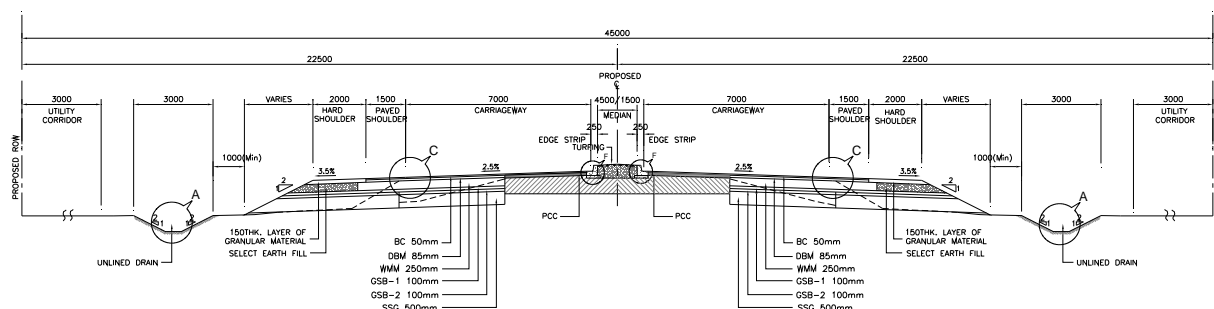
TYPICAL CROSS SECTION FOR CONCENTRIC WIDENING
